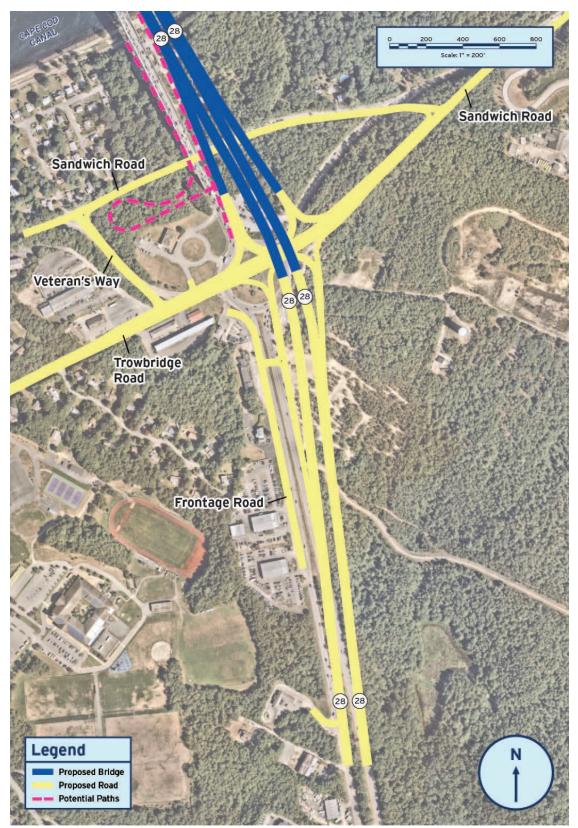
Bourne South Crossing Interchange Approach Option BS-2.2
